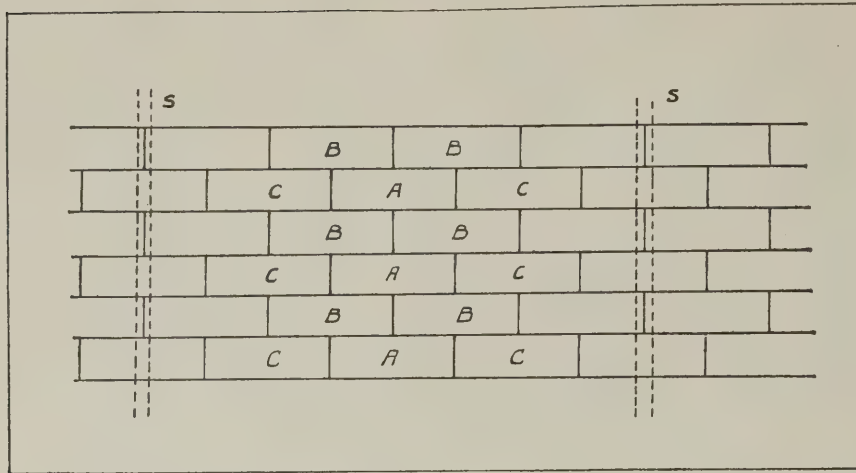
PLAN OF FLOOR SLAB UNITS.
